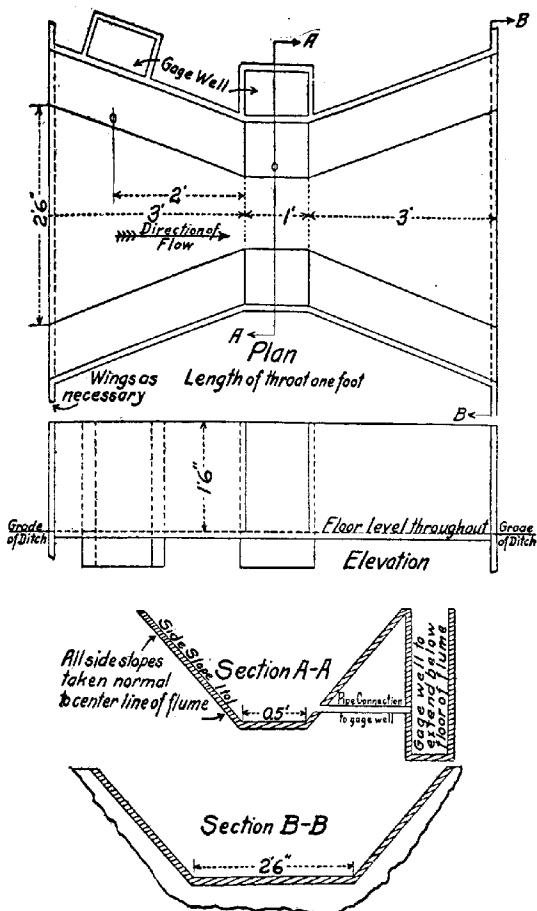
Plan for the trapezoidal Venturi flume with 0.5 foot bottom width, side slopes 1 to 1.
